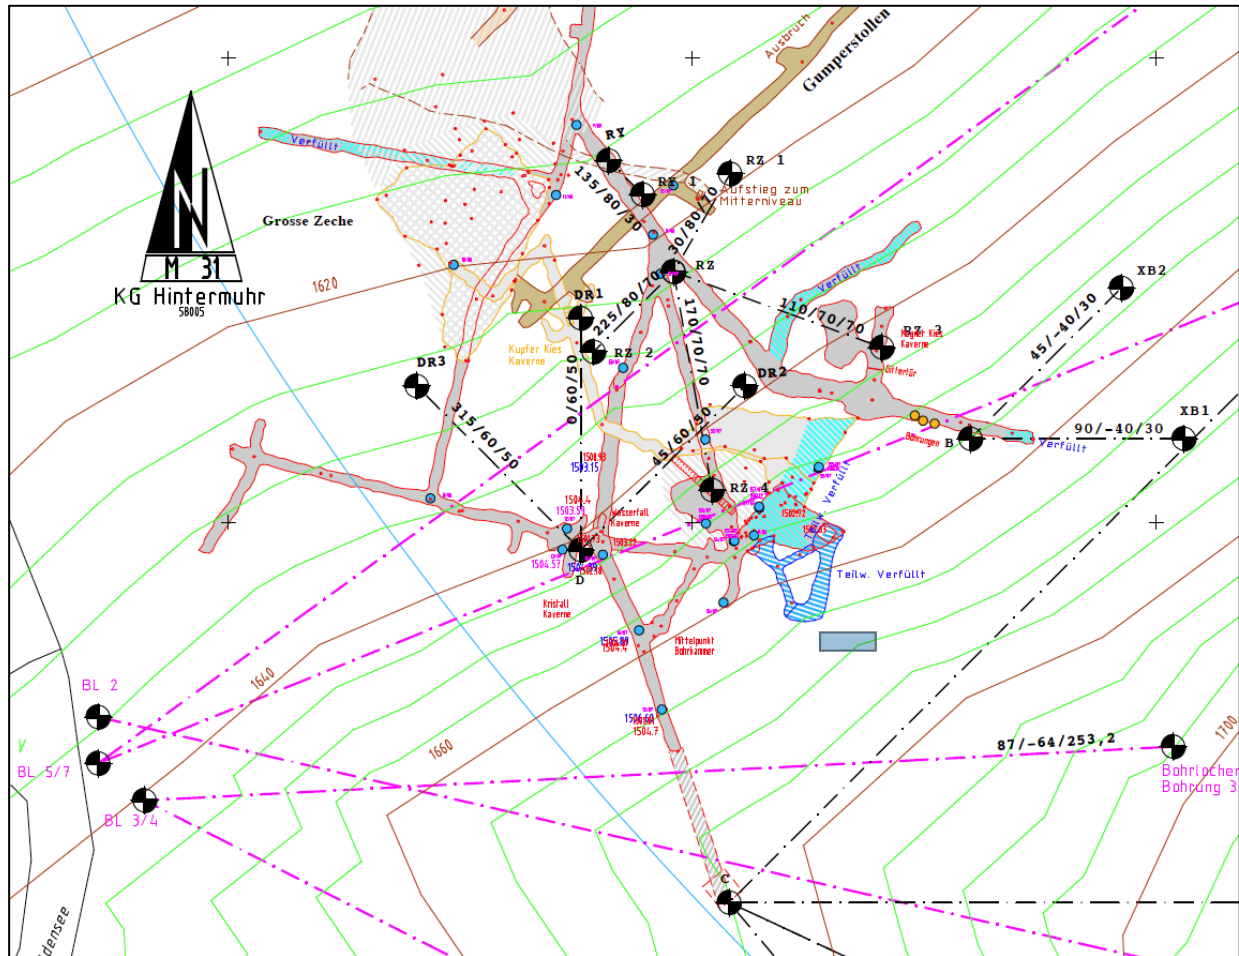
excerpt from underground plan detailing drilling locations (RZ, RY, D, C & B)
